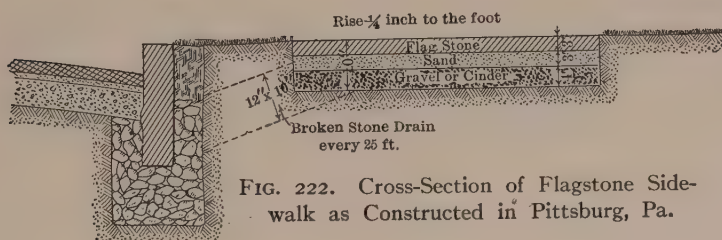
Cross-Section of Flagstone Sidewalk as Constructed in Pittsburg, Pa.
